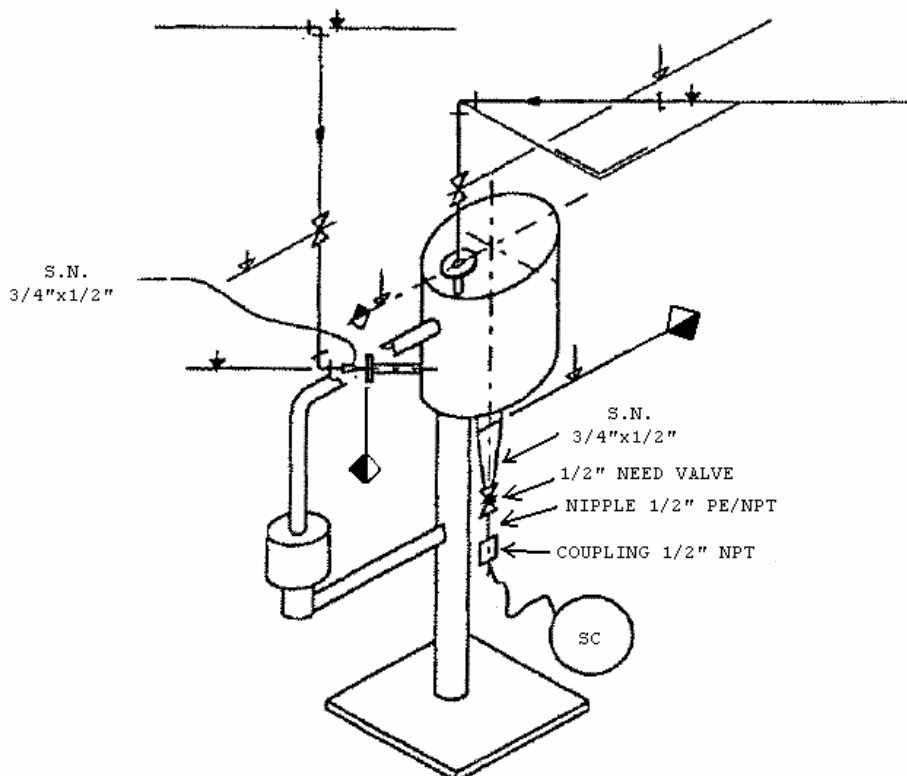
Typical installation of a cooled sample connection (case 1)
